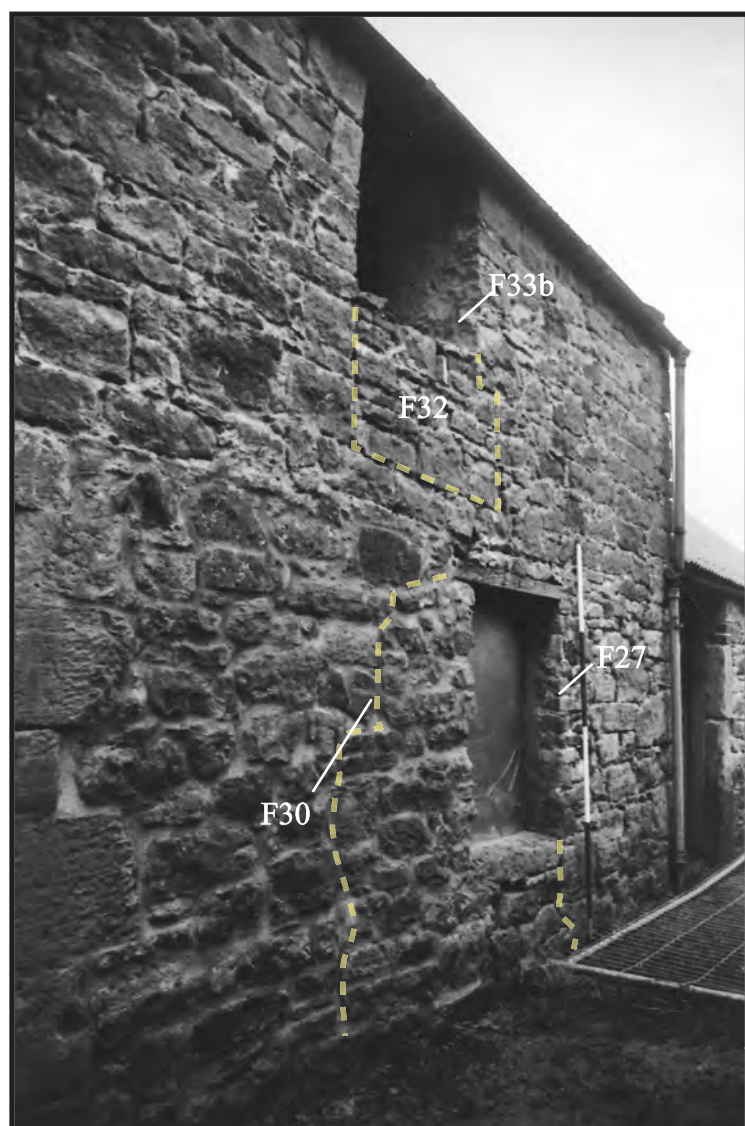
Detail of the ground floor window (F28) of the central wing of the south-east facing elevation of Building A - the yellow dashed line identifies the stone-blocked upper floor window (F32)
